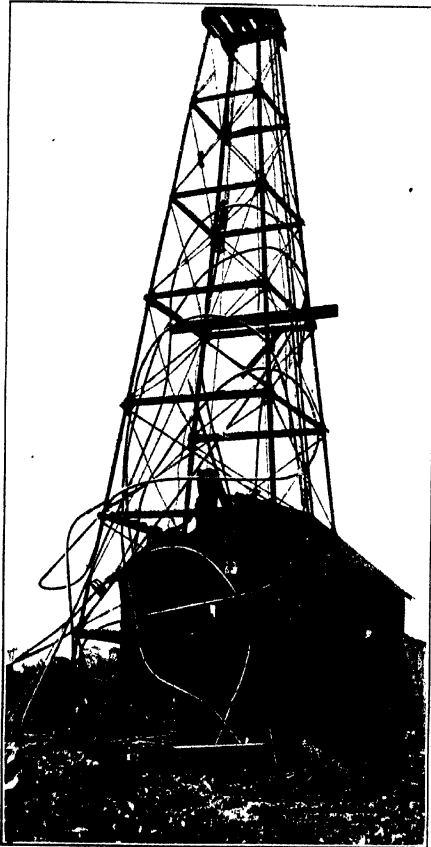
String of Wash Tubes Expelled by Eruption of Oil, Gas, and Sand during Cleaning Operations of a Plugged Oil Well
